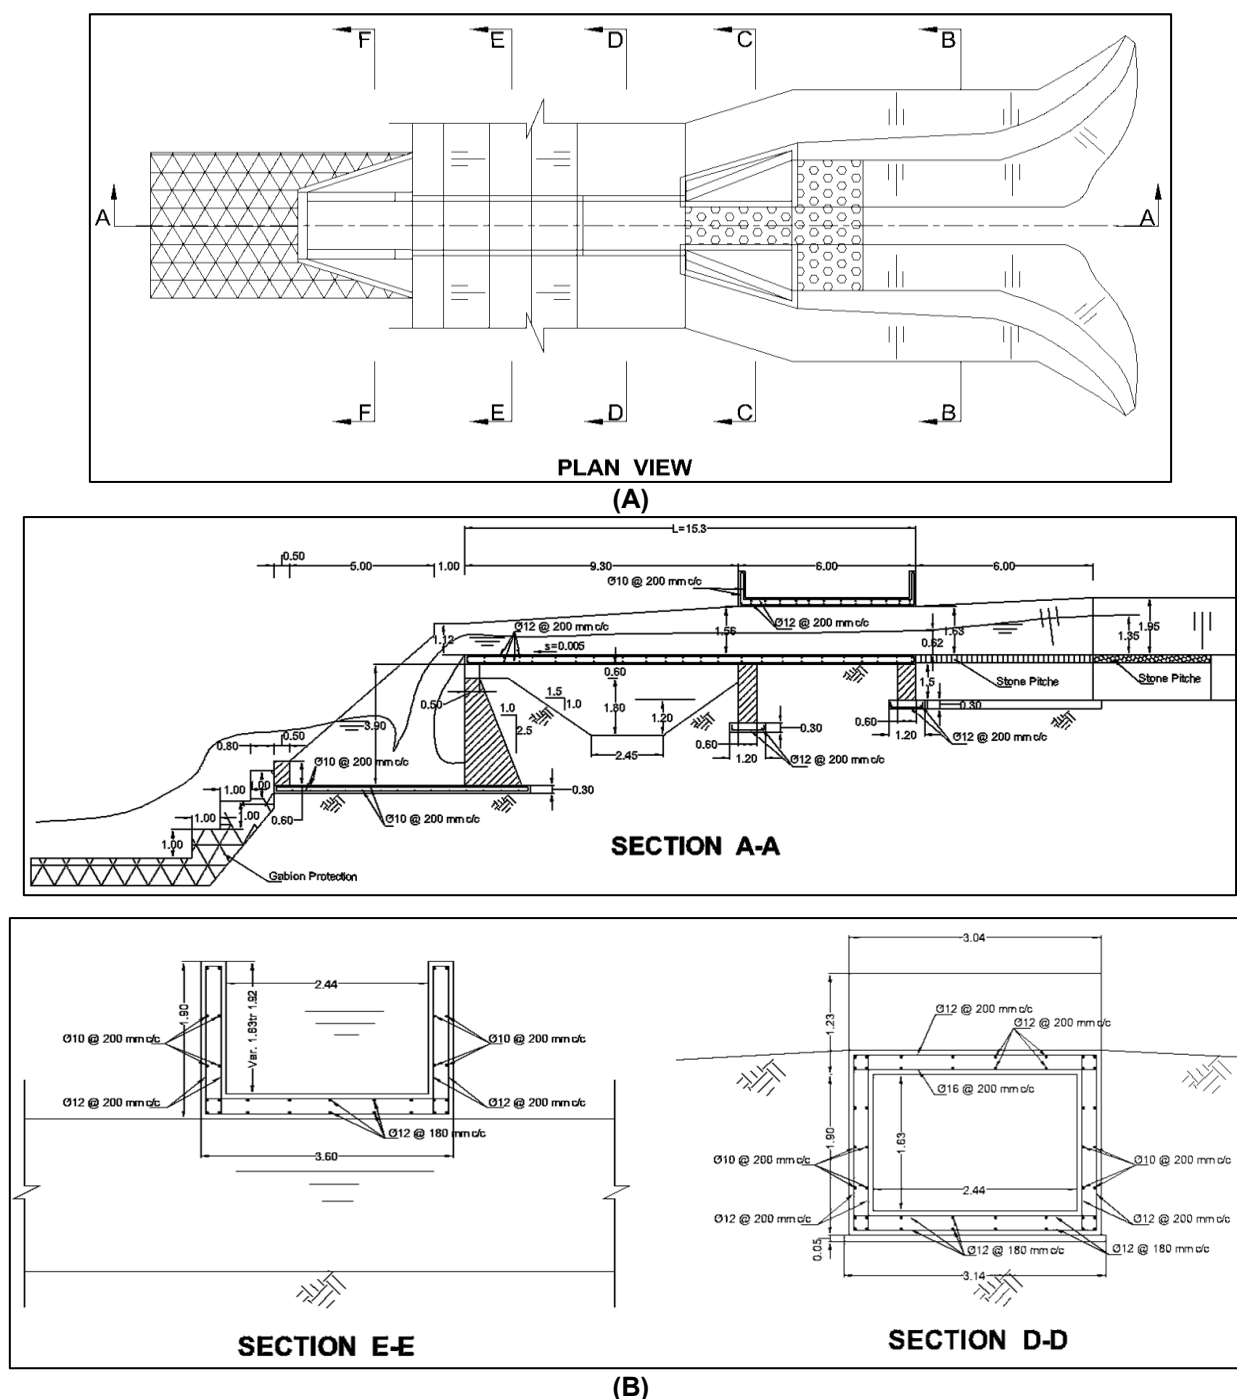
Over Chute (A) Plan View and (B) Sections and Structural Detail
